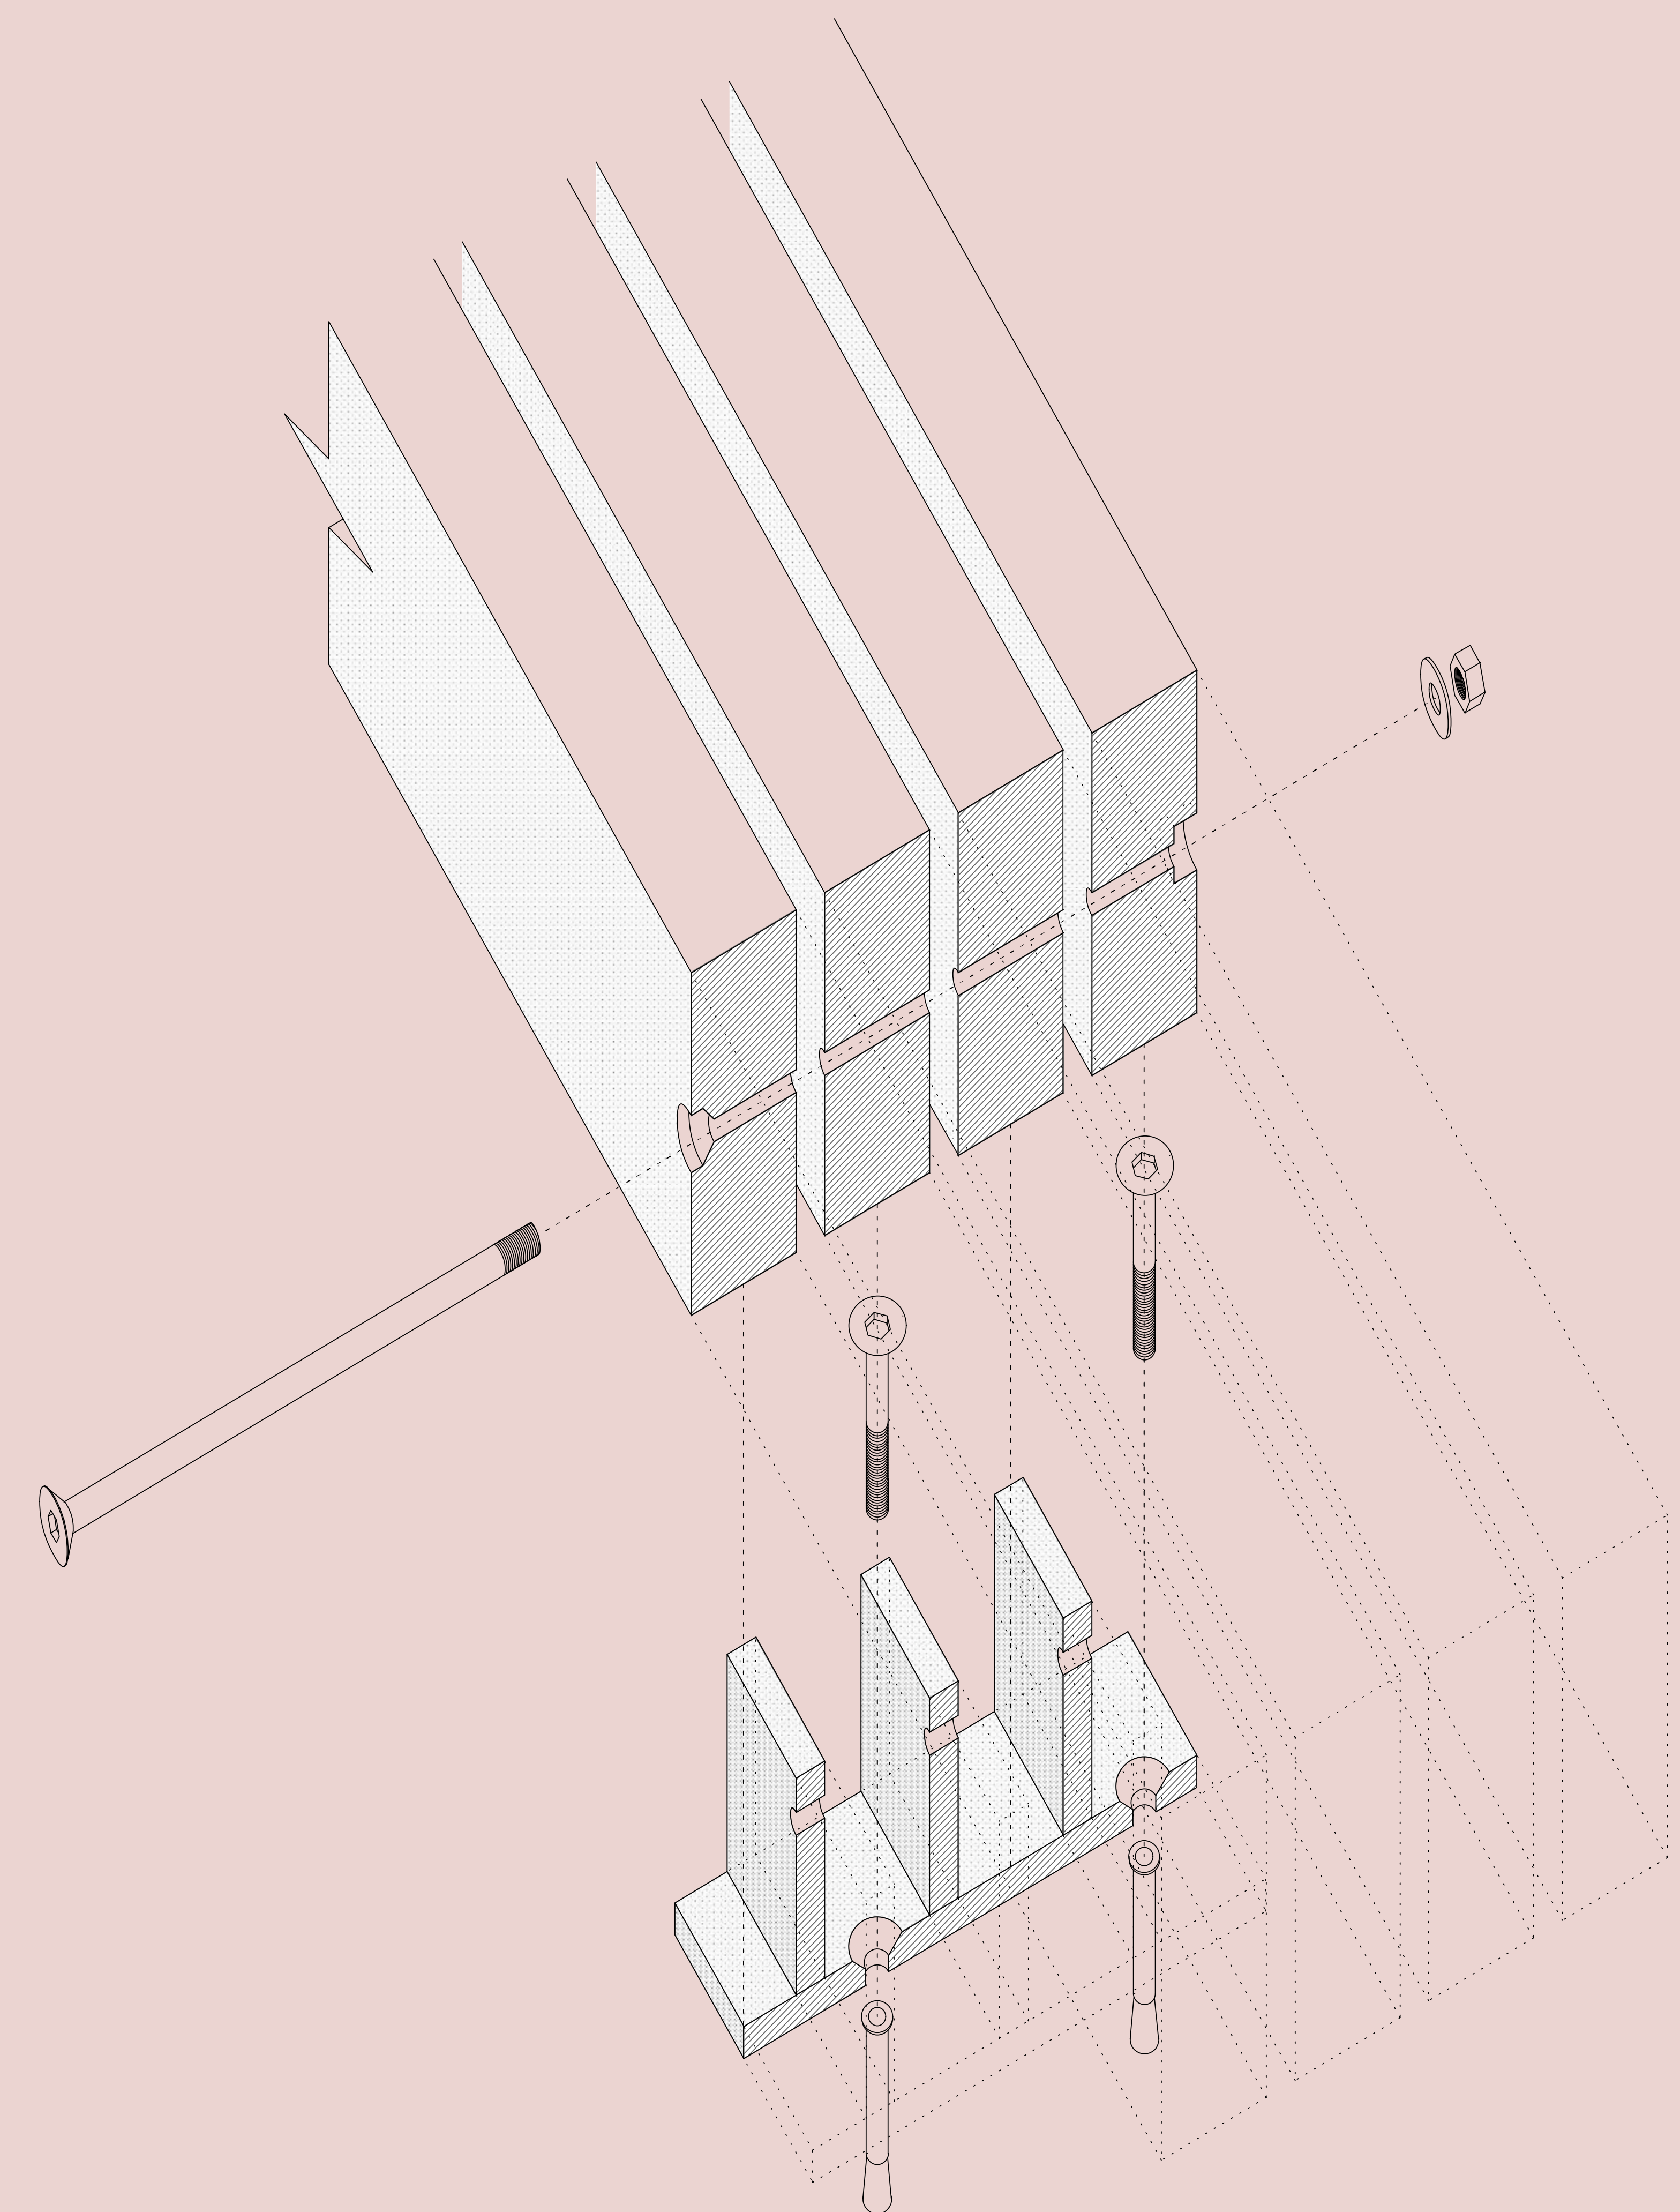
Exploded Axonometric Detail, Reversible Timber Construction, St. John Walsh / AY Architects
